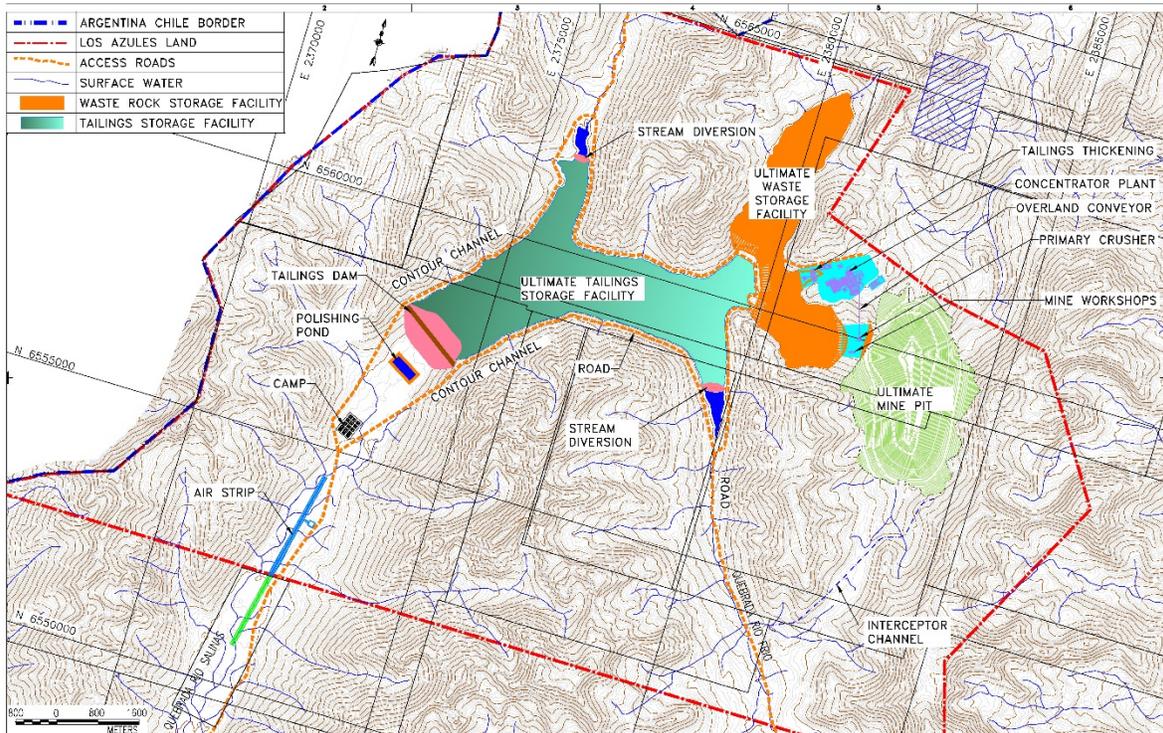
General Arrangement of Los Azules Site Installations & Infrastructure.
